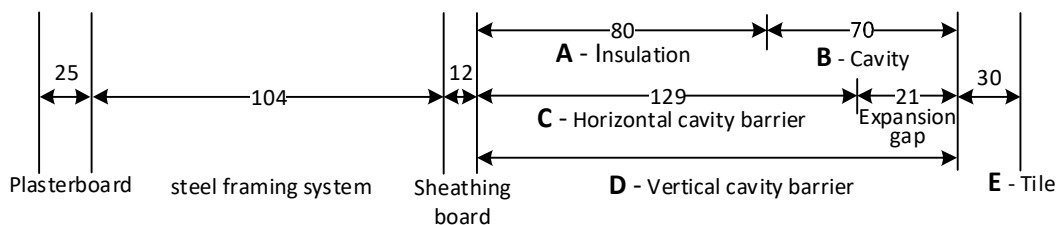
Basic system cross section (not drawn to scale, dimensions given in mm)
